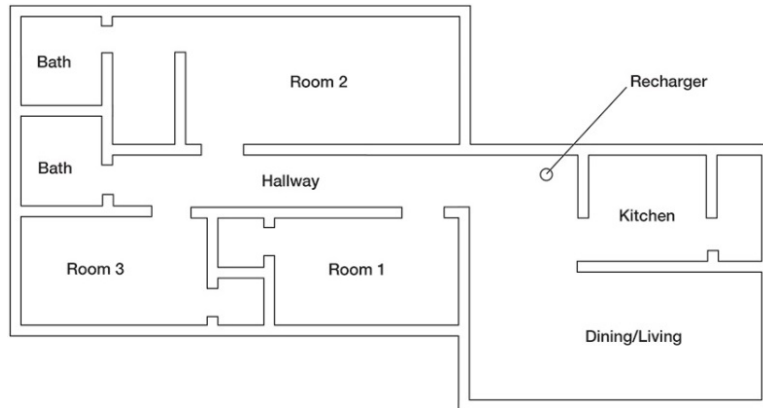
General floor plan (recalled from memory) of the Everett residence on Rickett's Road in Monterey, CA, showing the recharging station (small circle) at the right-most end of the hallway (Everett, 2005). The beacon on the recharger could be remotely activated by the robot to serve as a navigational aid.
